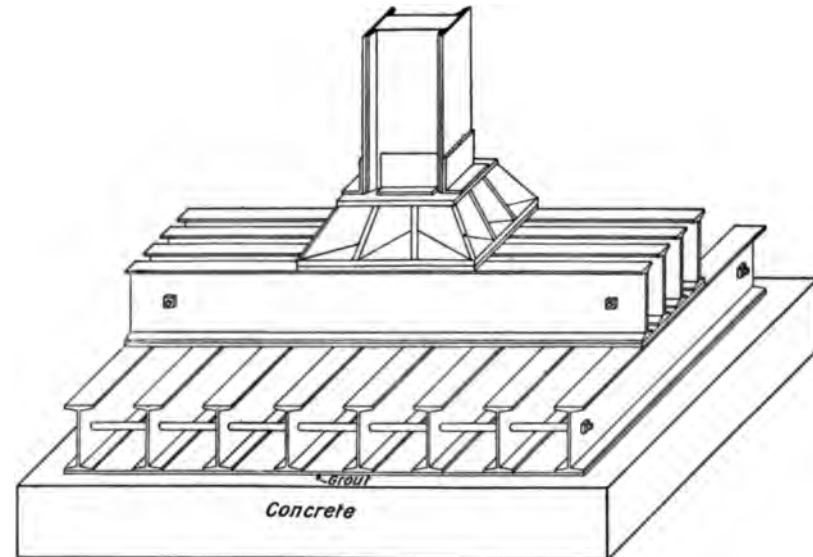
Grillage Footing (Concrete Filling Not Shown).
